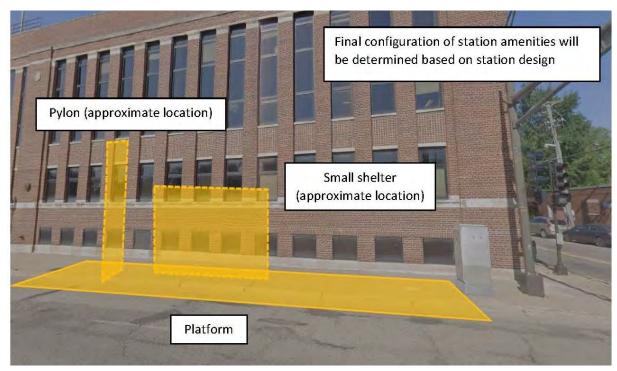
Rice Street and Atwater Street southbound platform immediately adjacent to the east half of the Saint Paul Gas and Light Company building facade, facing west from Rice Street.
